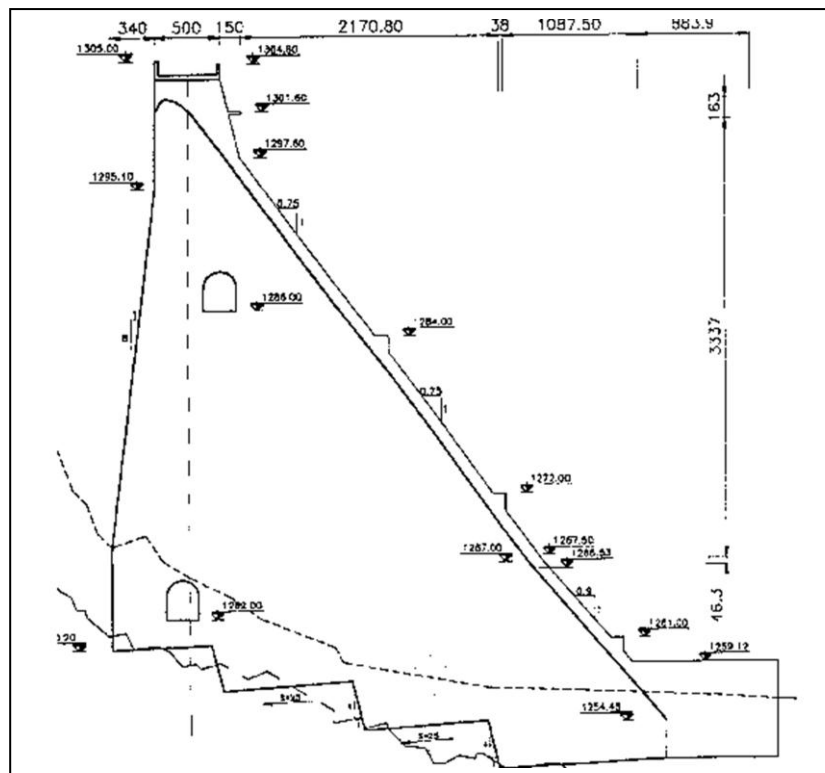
Central Cross Section of ZAVIN Dam [9]
